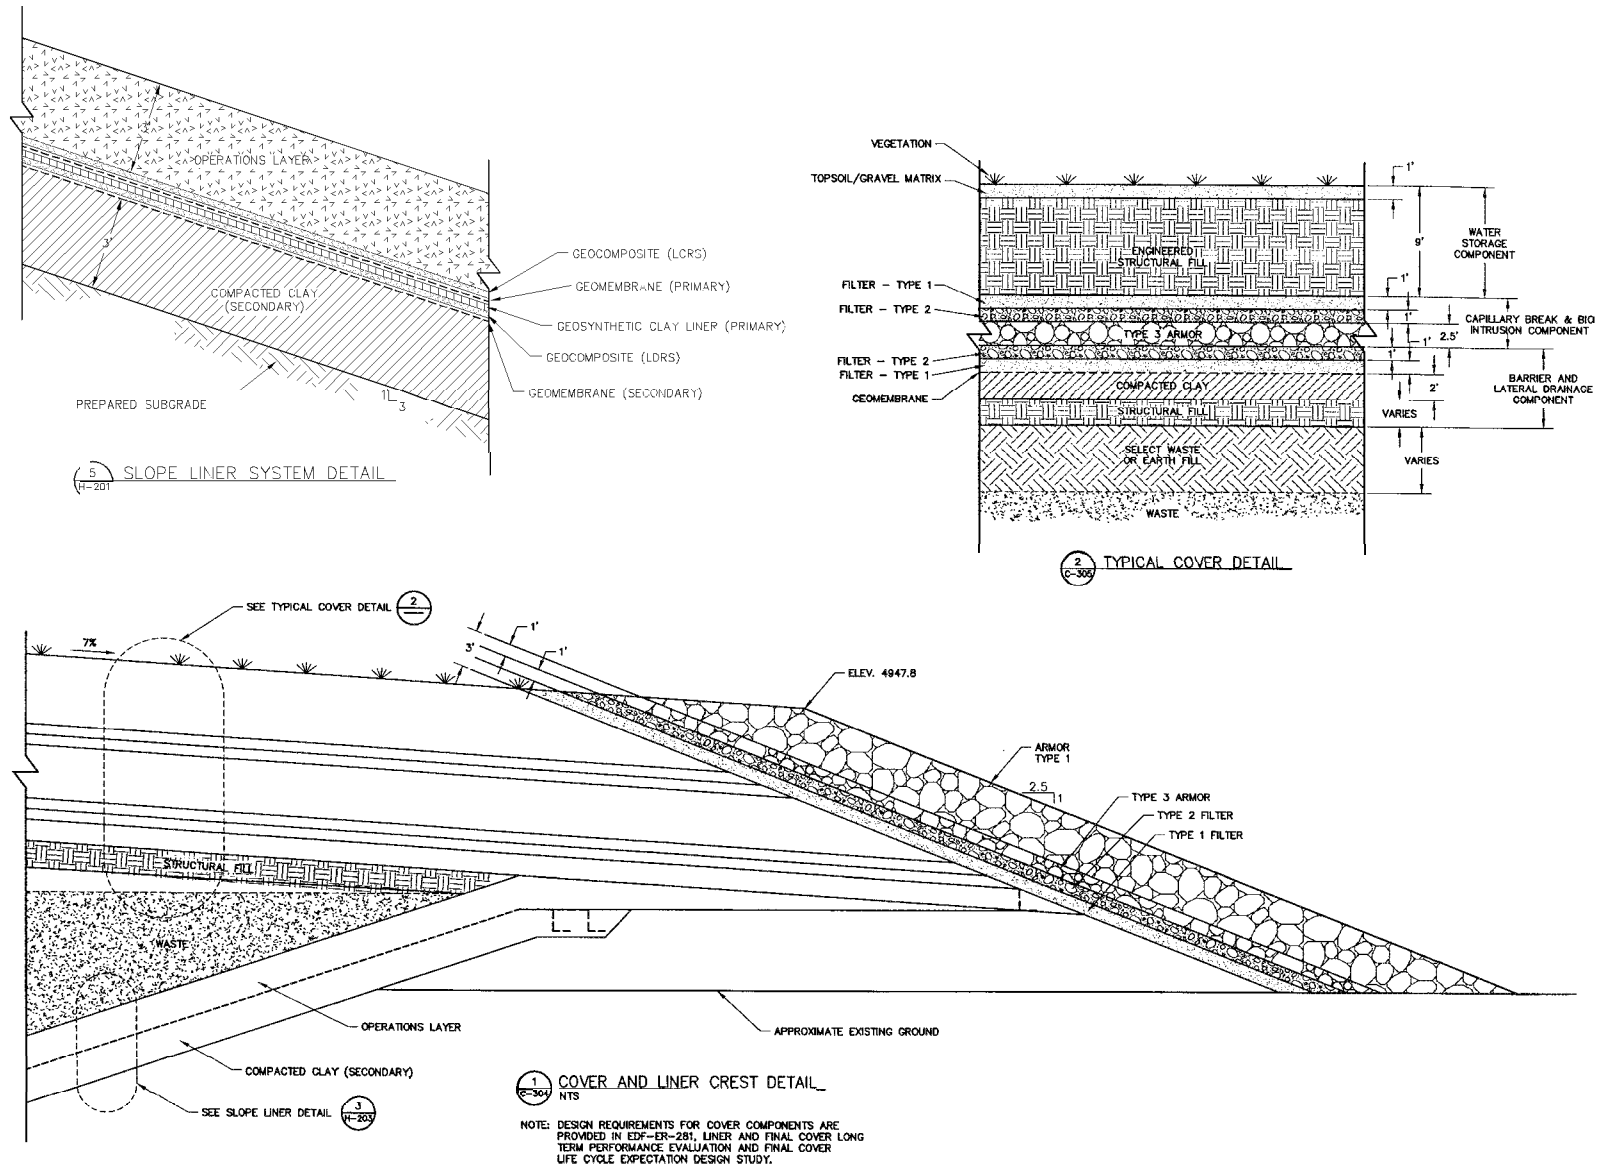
INEEL CERCLA Disposal Facility landfill design elements.
